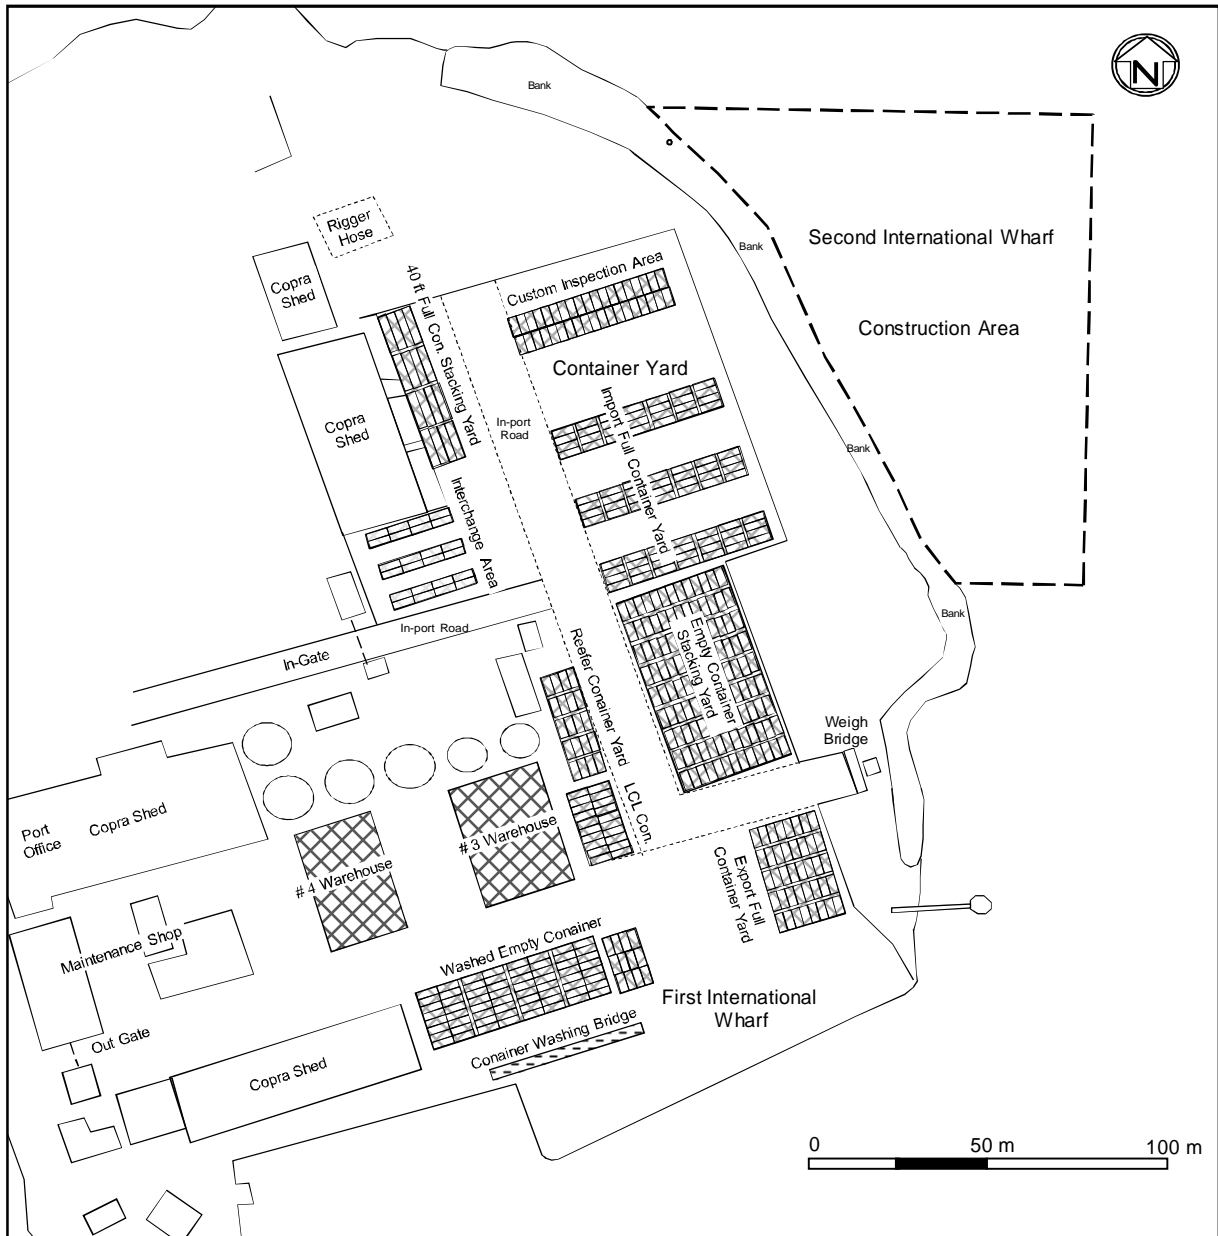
Existing Container Yard Layout Plan in Honiara Port
